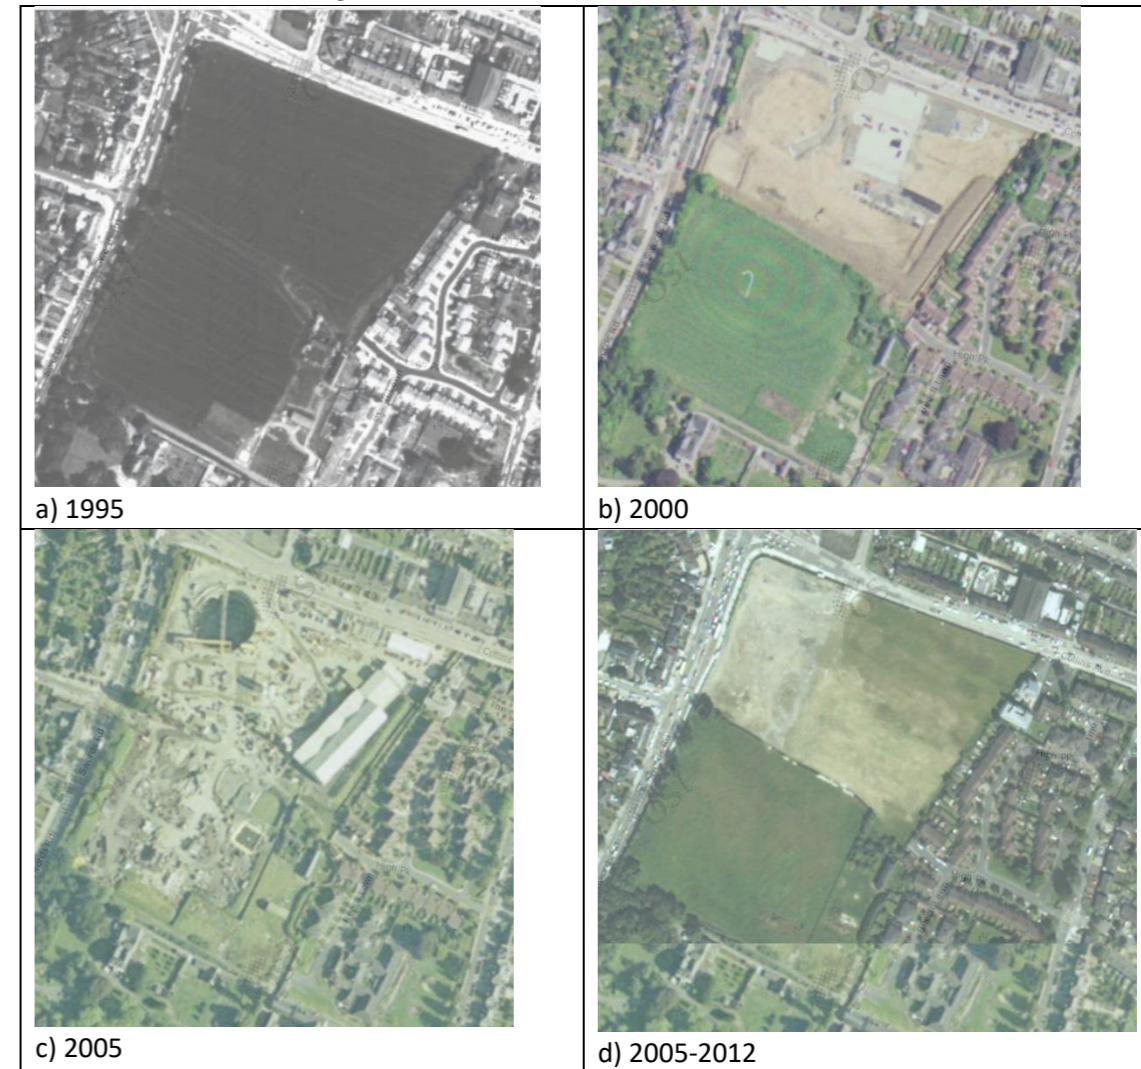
Changes in land use of site and surrounds: (a) prior to Dublin Port Tunnel works (b & c) during building of Port Tunnel and (d) showing revegetation after completion of tunnel works (OSI, 2020).
